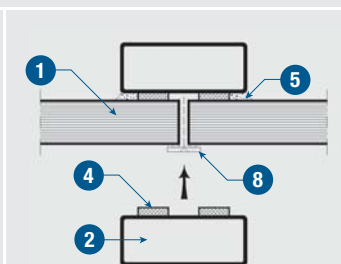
Elevation (Horizontal and vertical externally framed joints)
